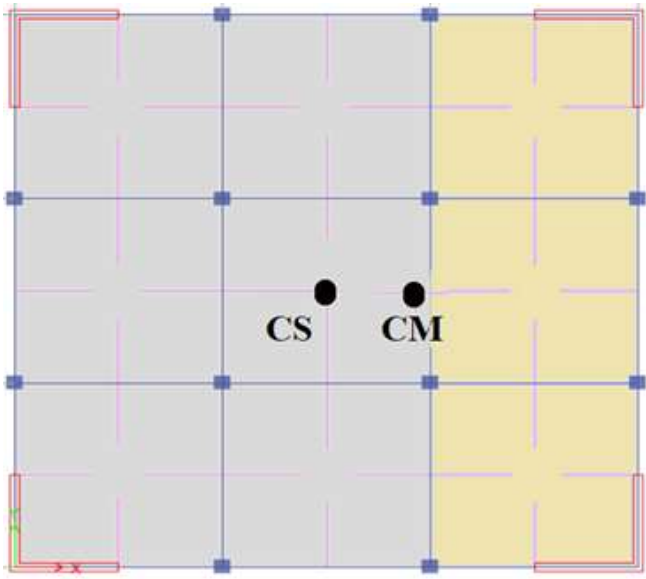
Plan of G+5 storied RCC Shear Wall Building with Eccentricity
